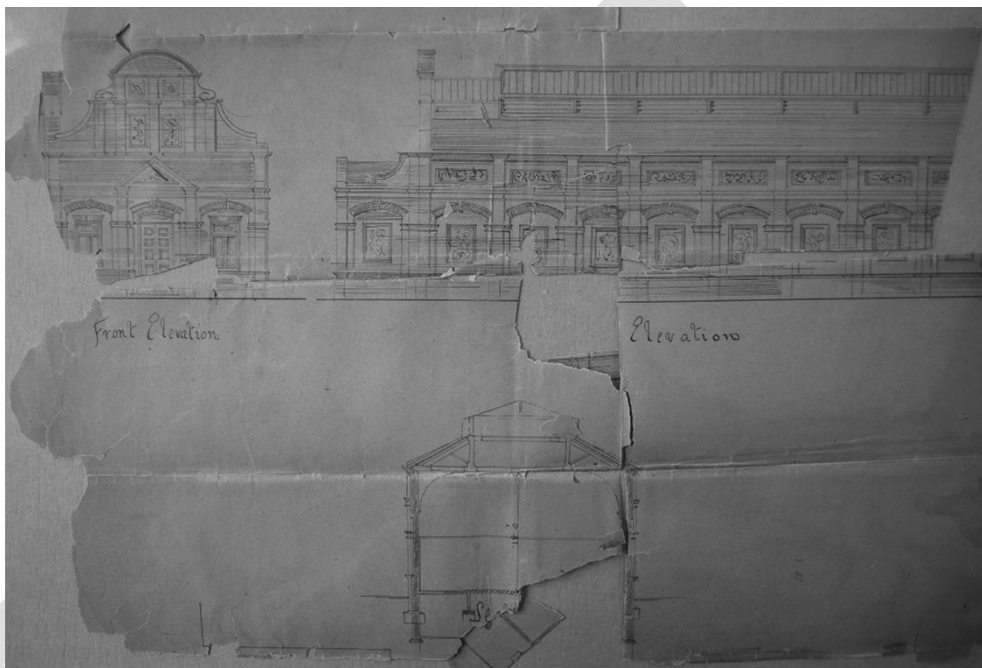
1879. Plans for the new Art Gallery (Suffolk Record Office, drainage plan no. 1323).
